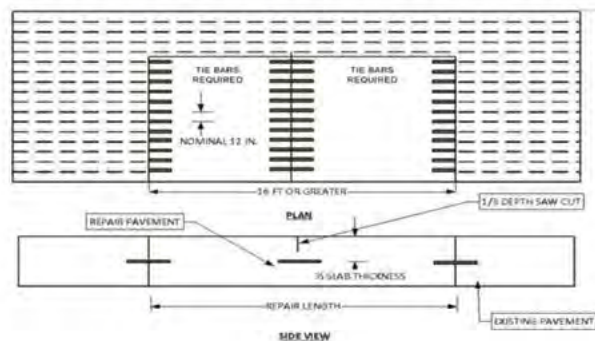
Tie bars drilled into existing CRCP for splicing with new reinforcement in FDR (Texas).
